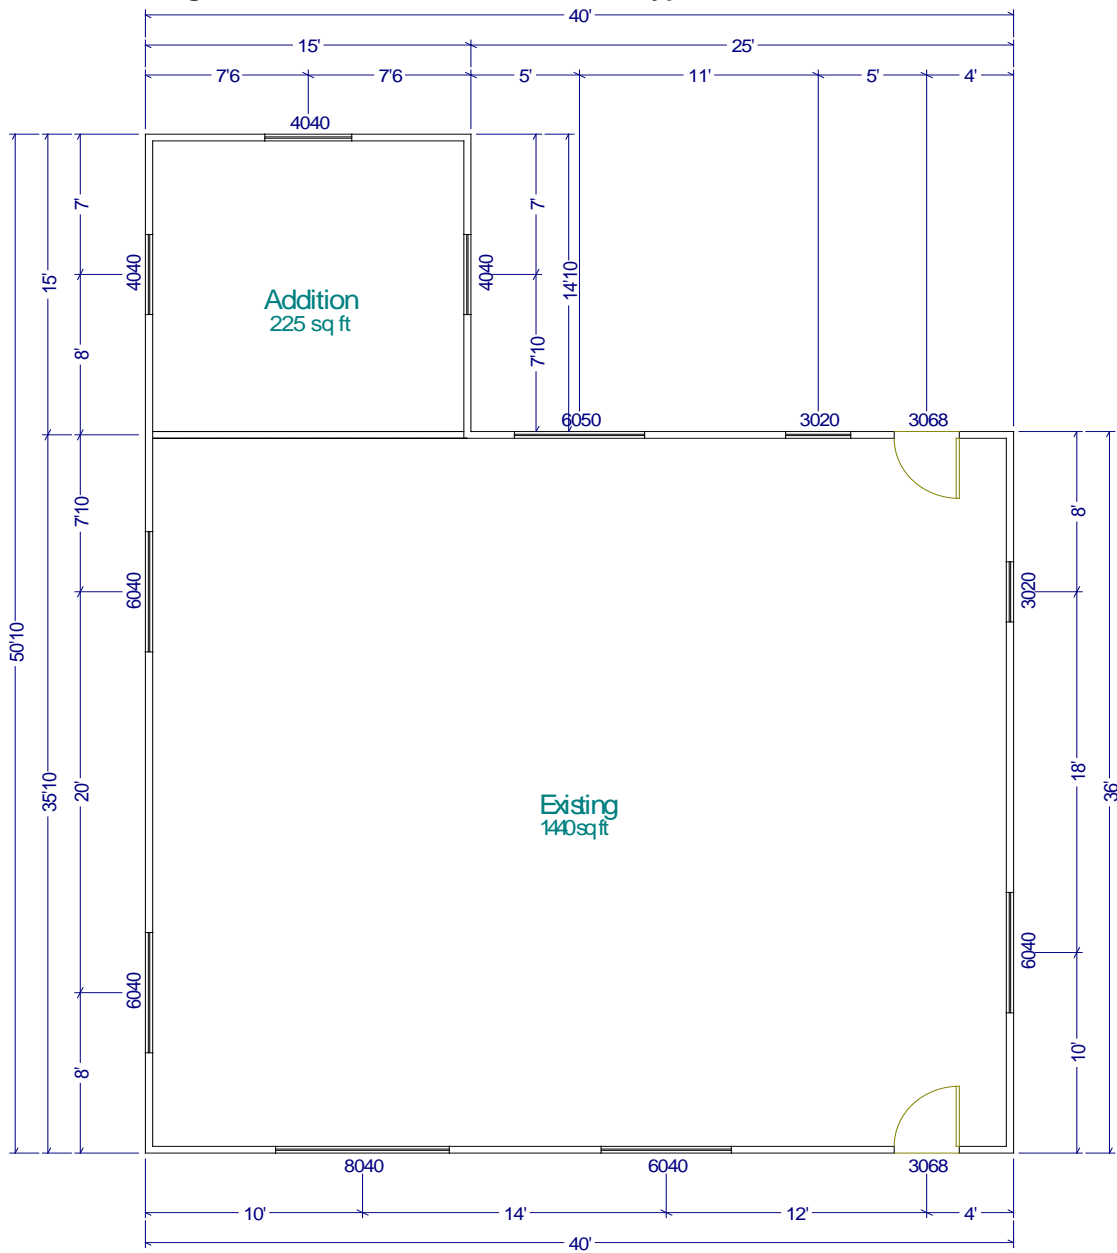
Addition/Alteration Prototype Floor Plan with Addition
